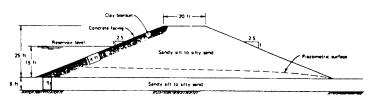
Cross section through Sheffield Dam at time of failure (After Seed et. al., 1969)
